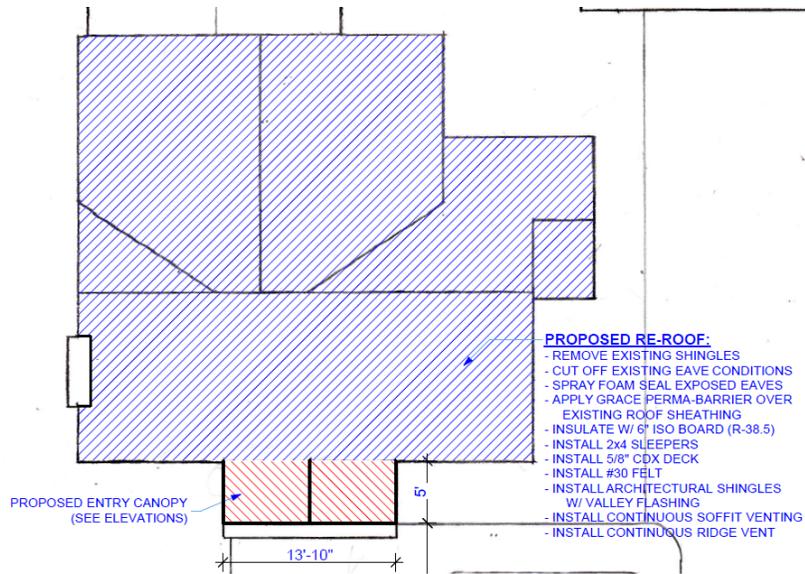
Roof overview of Cocoon St. Louis Park House pre-retrofit with proposed details of portico in red
